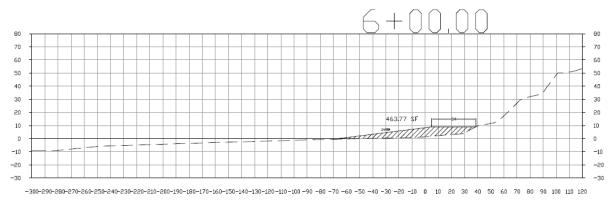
(c). Typical beach fill cross-section at Sta 6+00
